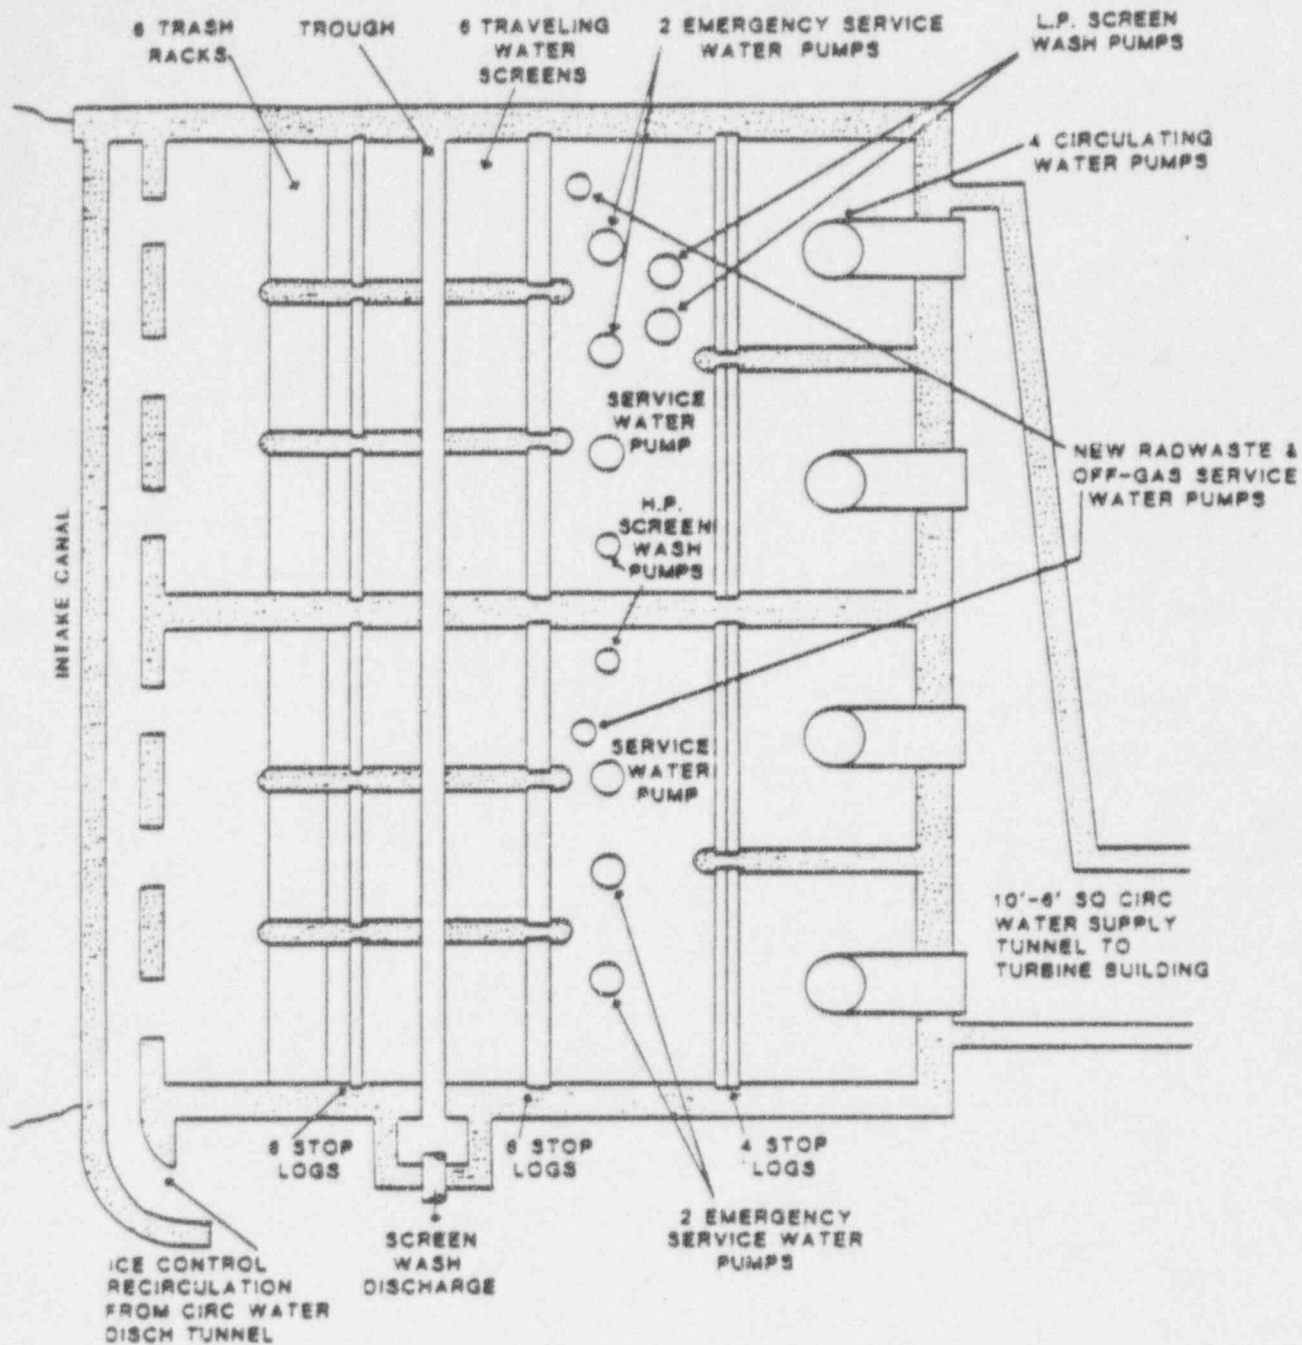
OCNGS Circulating Water System Intake Structure in plan view.
